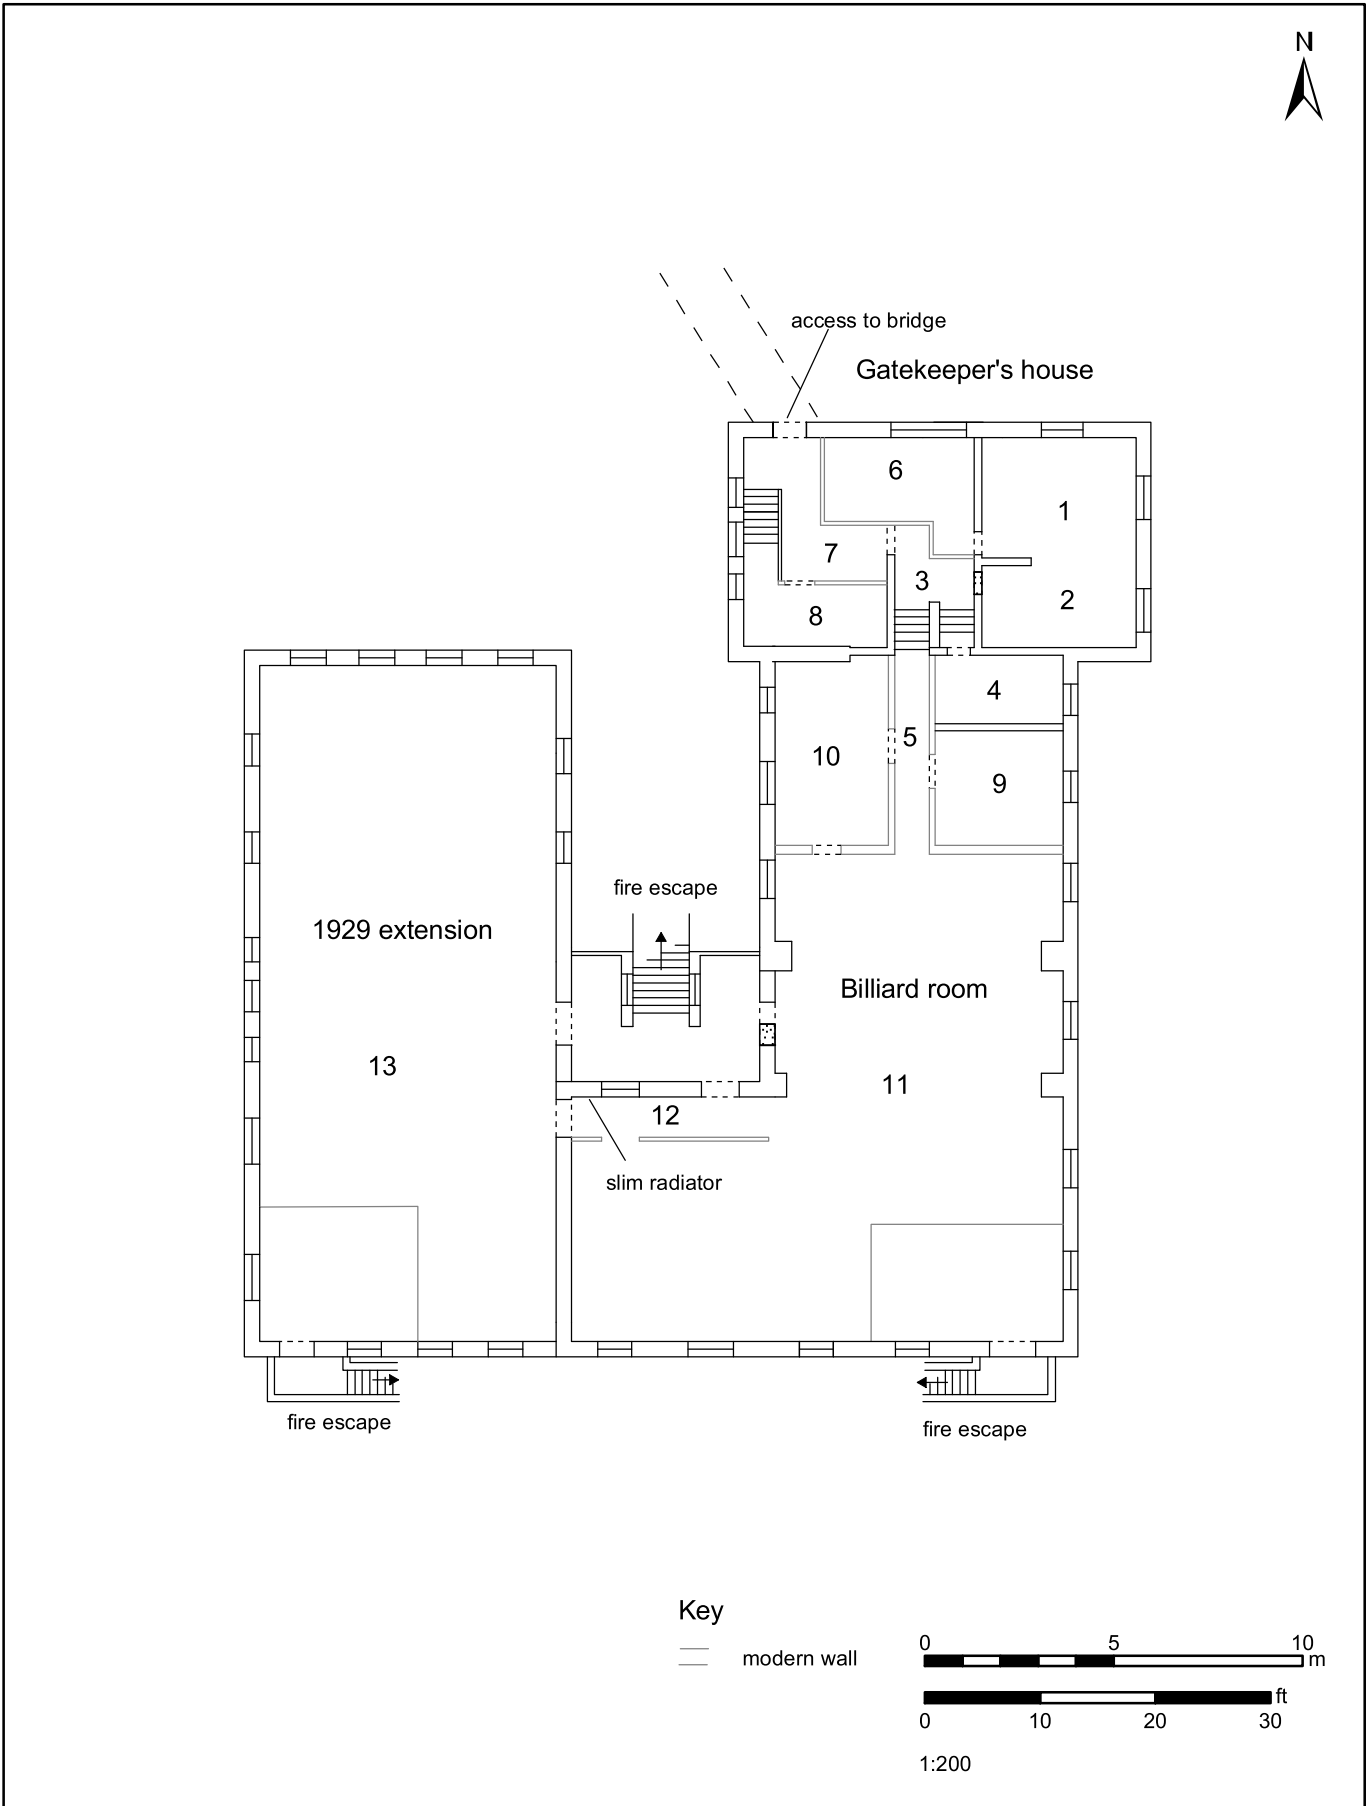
Gatekeeper's house, mess rooms and 1920's extension - first floor plan
